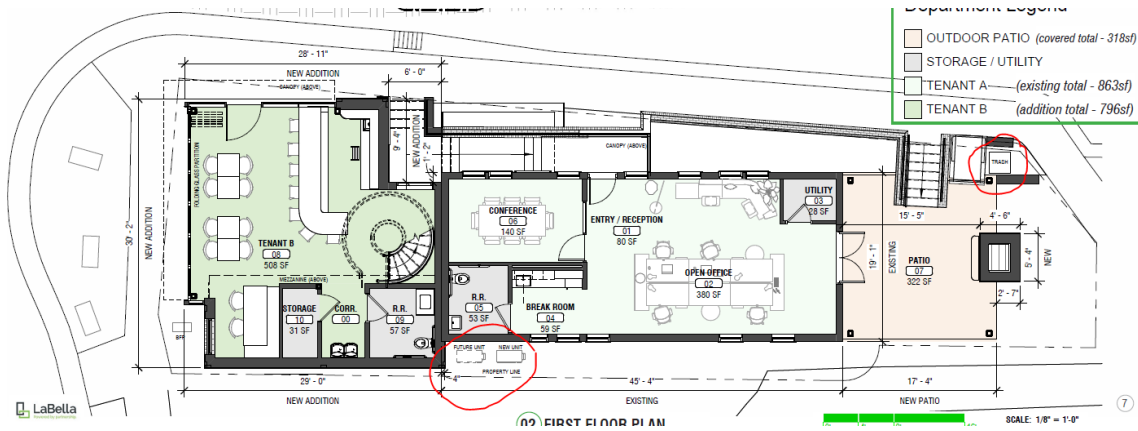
Current First-floor Plan w/ Trash & Mechanical Units Shown
